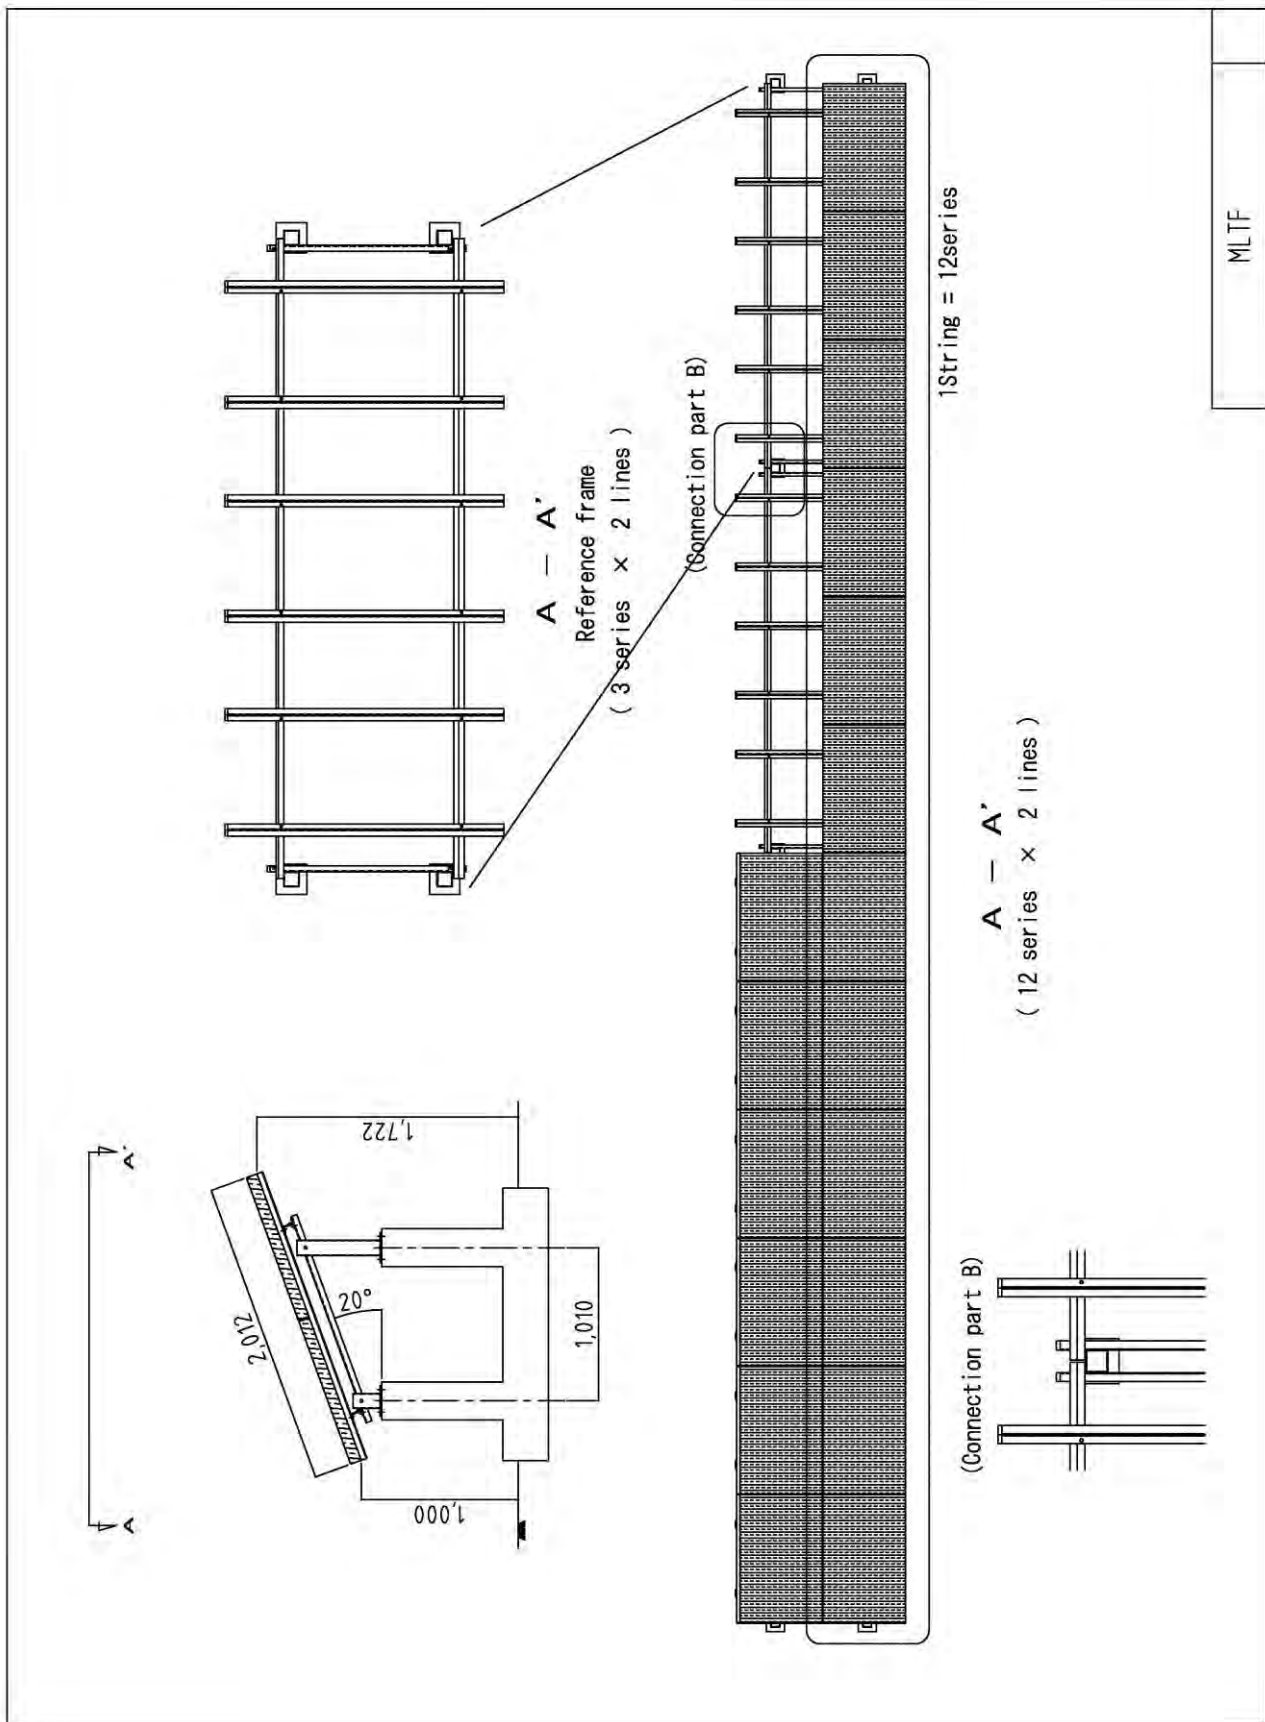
Frame and foundation image for 1 (one) array of MLTF
